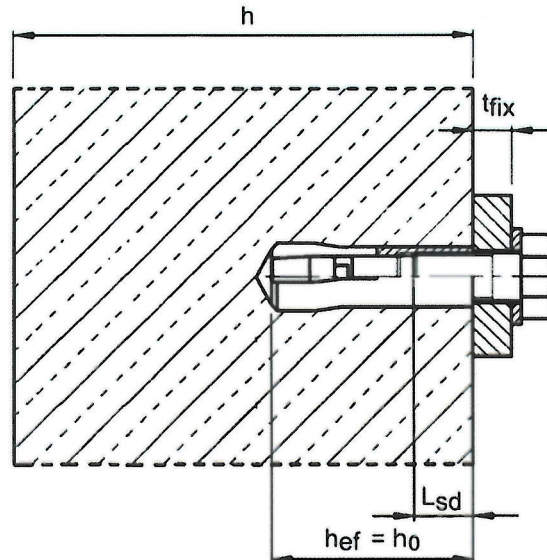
Installation situation of the MÜPRO Steel Anchor with shoulder
